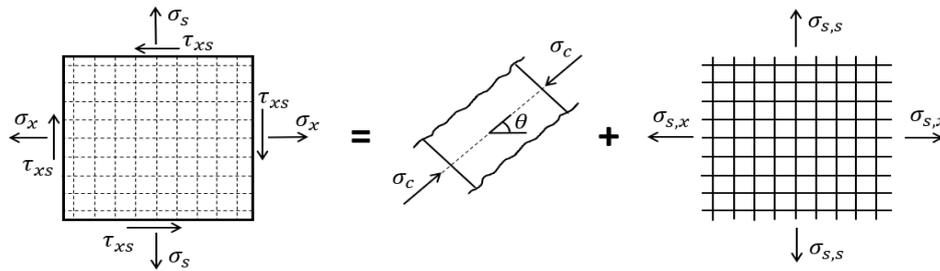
Internal membrane cracked equilibrium of reinforced concrete slab to find out the deformation damage
